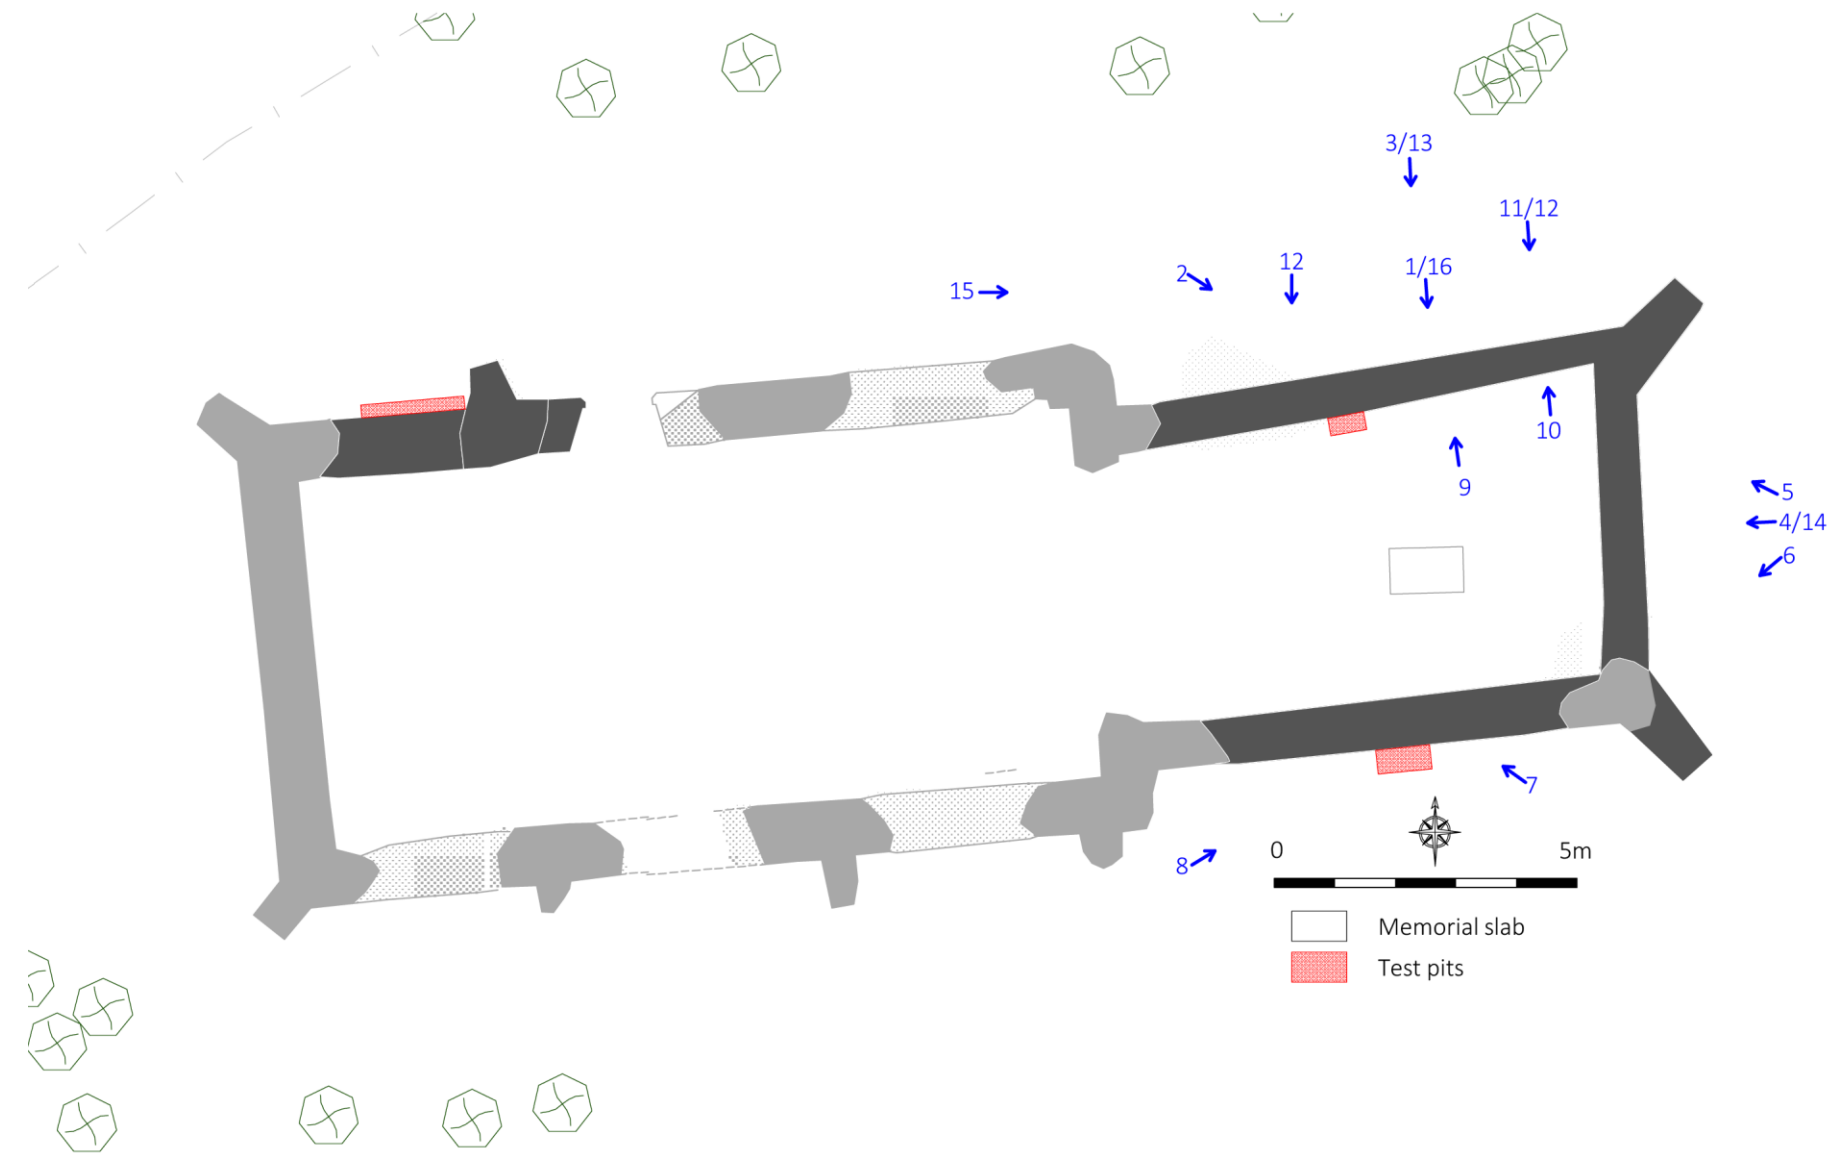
Photo plan 7<sup>th</sup> July 2022 (scale 1:125)
